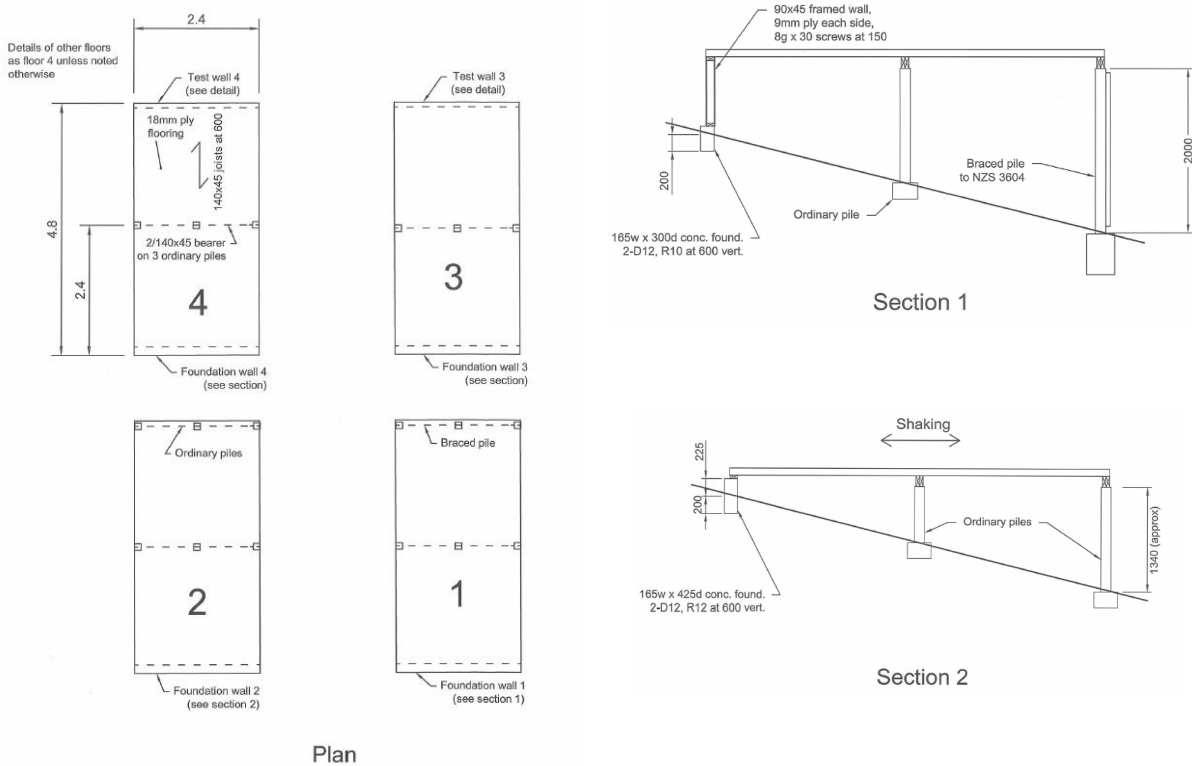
Layout of the four specimens (left) and sections through specimen 1 (top right) and specimen 2 (bottom right)
